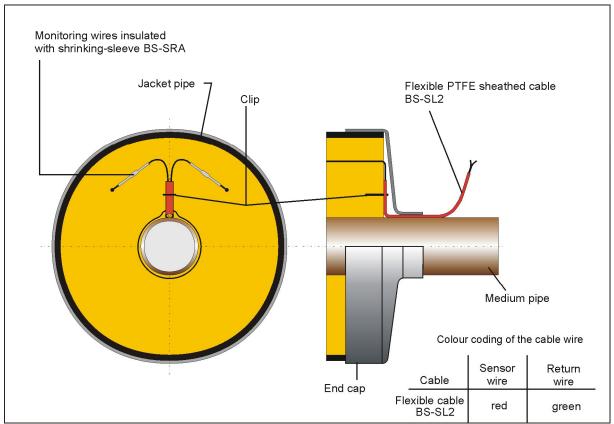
Example 1: Connecting the monitoring wires to flexible sheathed cable BS-SL2 and leading the wires out(Th0081 EN.jpg)
